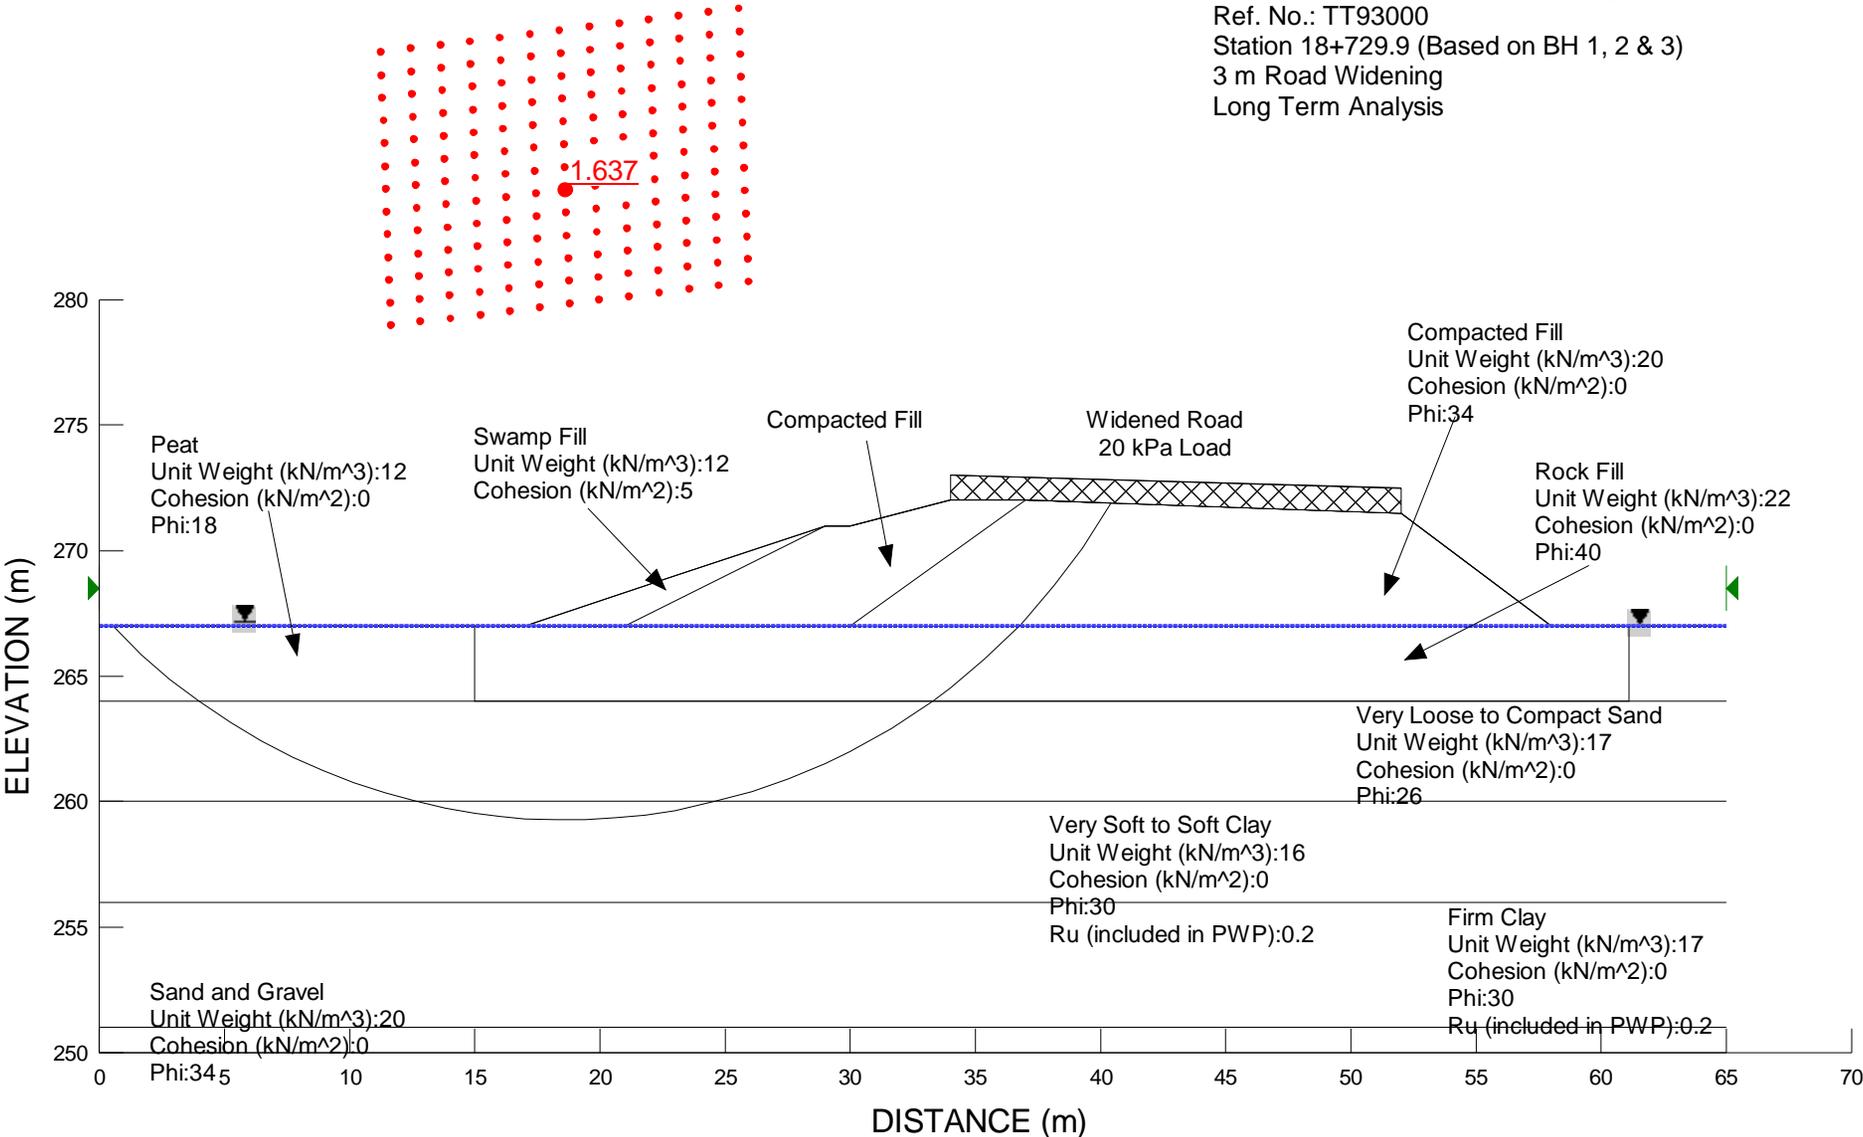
Slope Stability Analysis of Section at Station 18+730 with 3 m Road Widening (Long Term Analysis)
